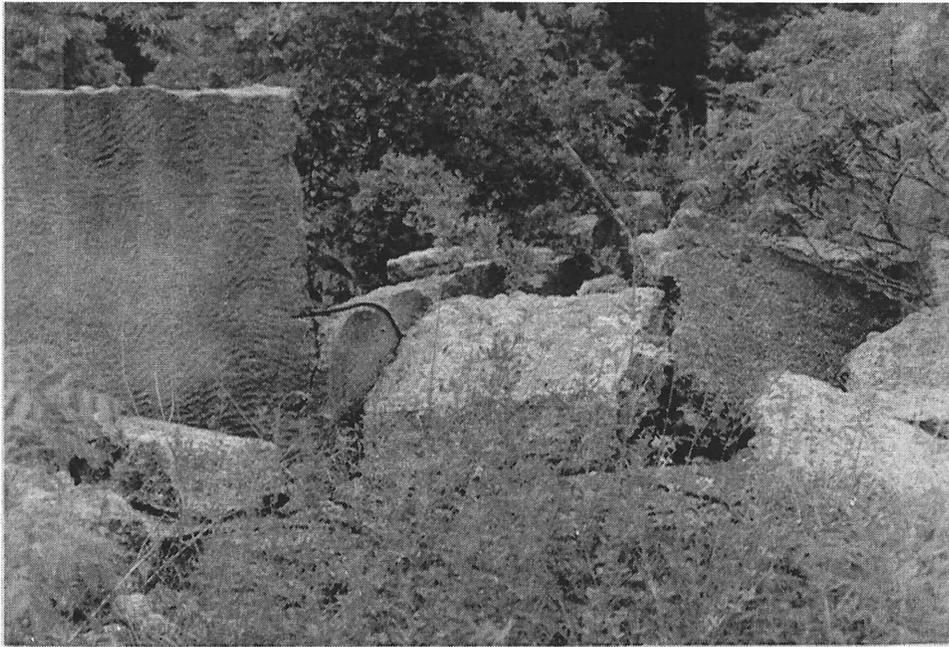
34CM410, Structure 1 looking west at northeast corner and collapsed north wall
